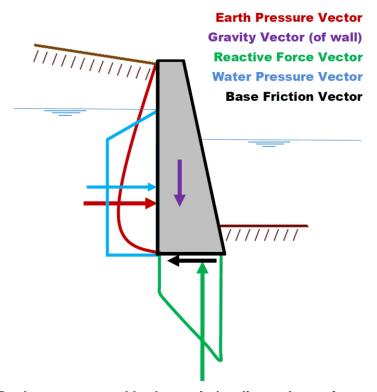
Earth pressure and hydrostatic loading schema for a gravity wall
